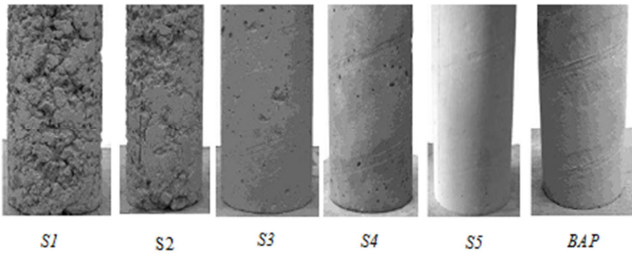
Examples of facings of non-vibrated 16/32 specimens.
